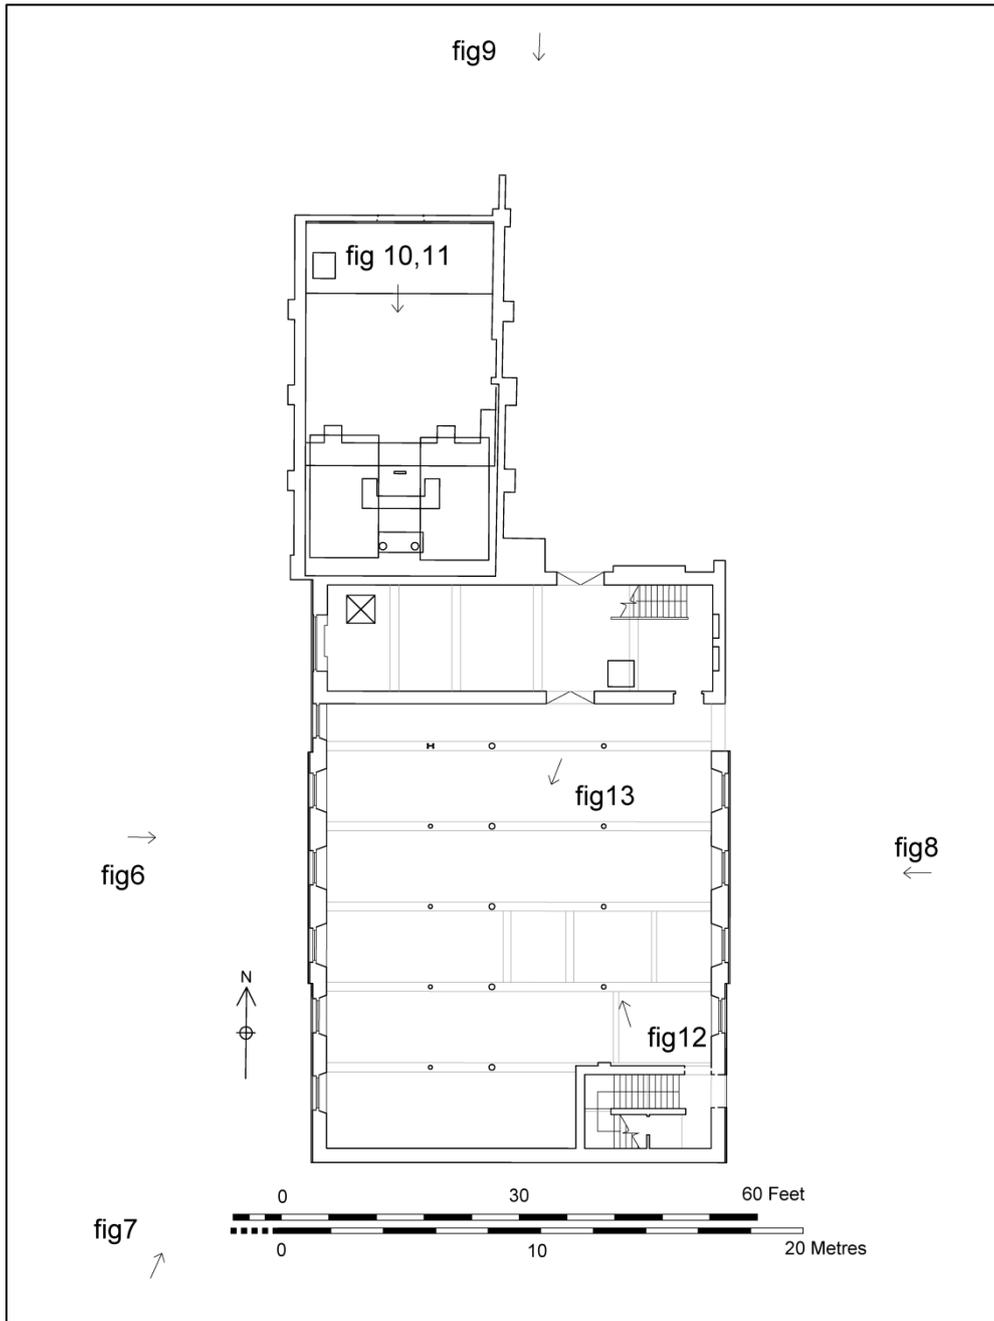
Location of selected photographs (figs 6-13) on ground floor plan of Friars Mill and Boiler House, to north (plan produced by Greenhatch Architects).
